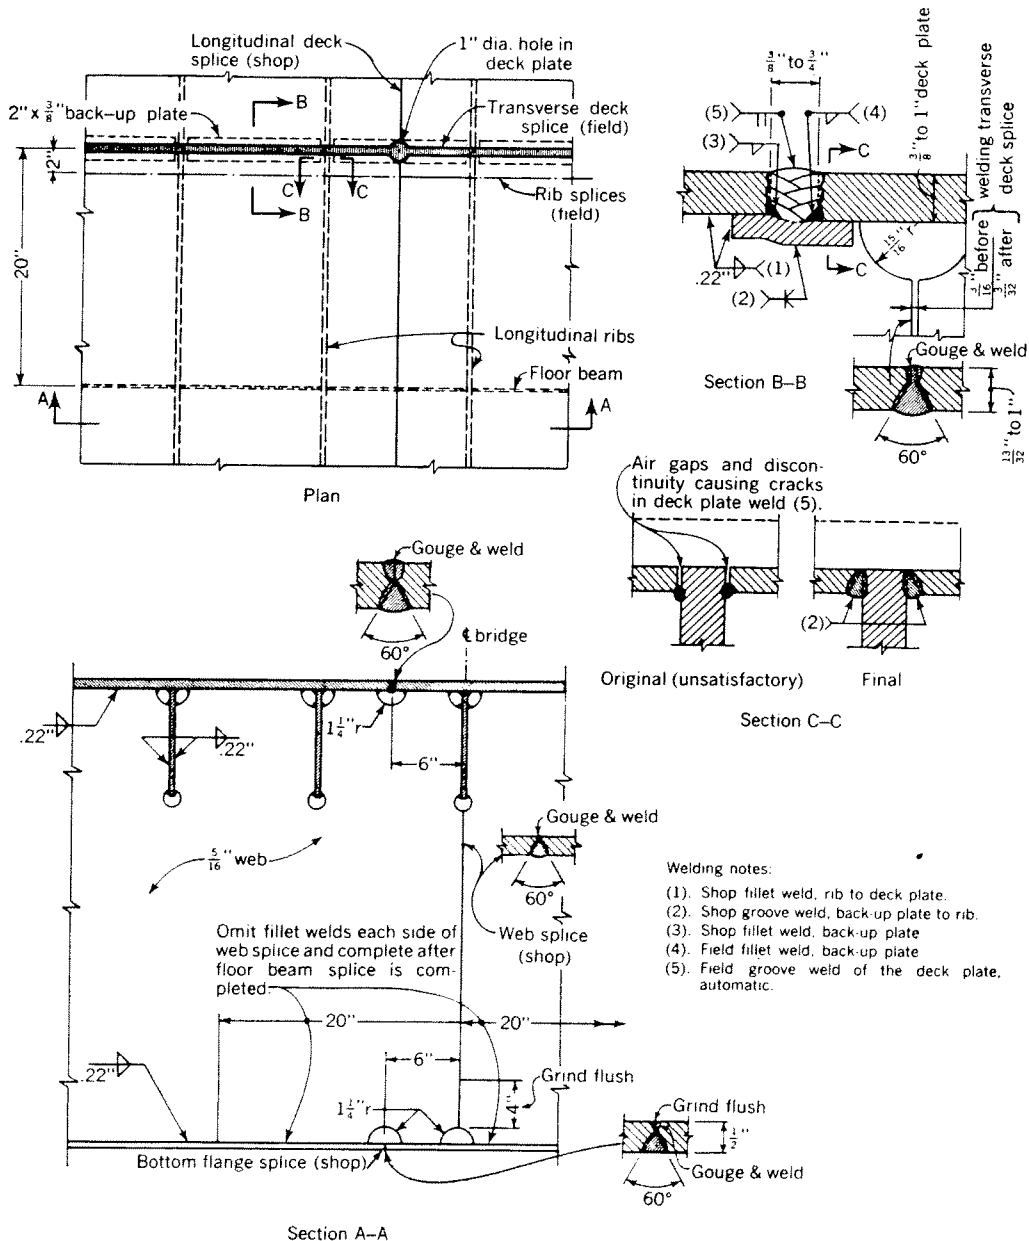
Deck splice details, Save River Bridge [42, 76]
